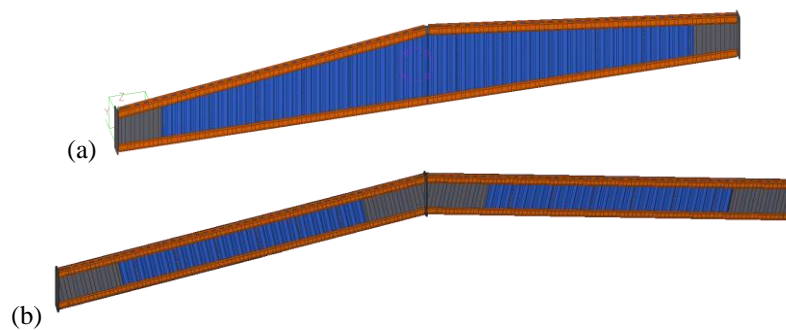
(a) 12 m span trapezoidal beam with corrugated web; (b) 16 m span parallel flanges sloped beam
